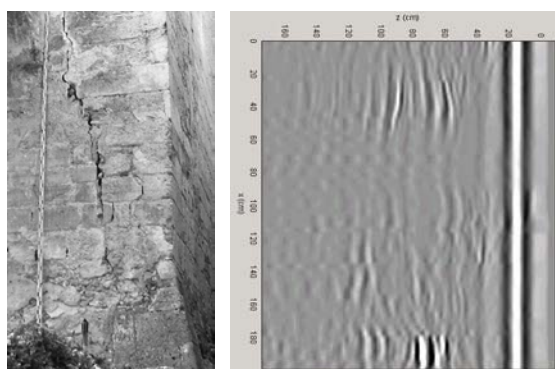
Cracks as observed on the adjacent wall and processed radar section.
